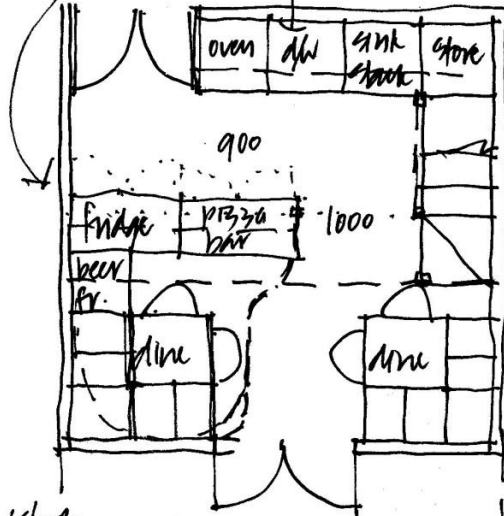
Design study – high ceilings, light and air are musts in creative suburb spaces
